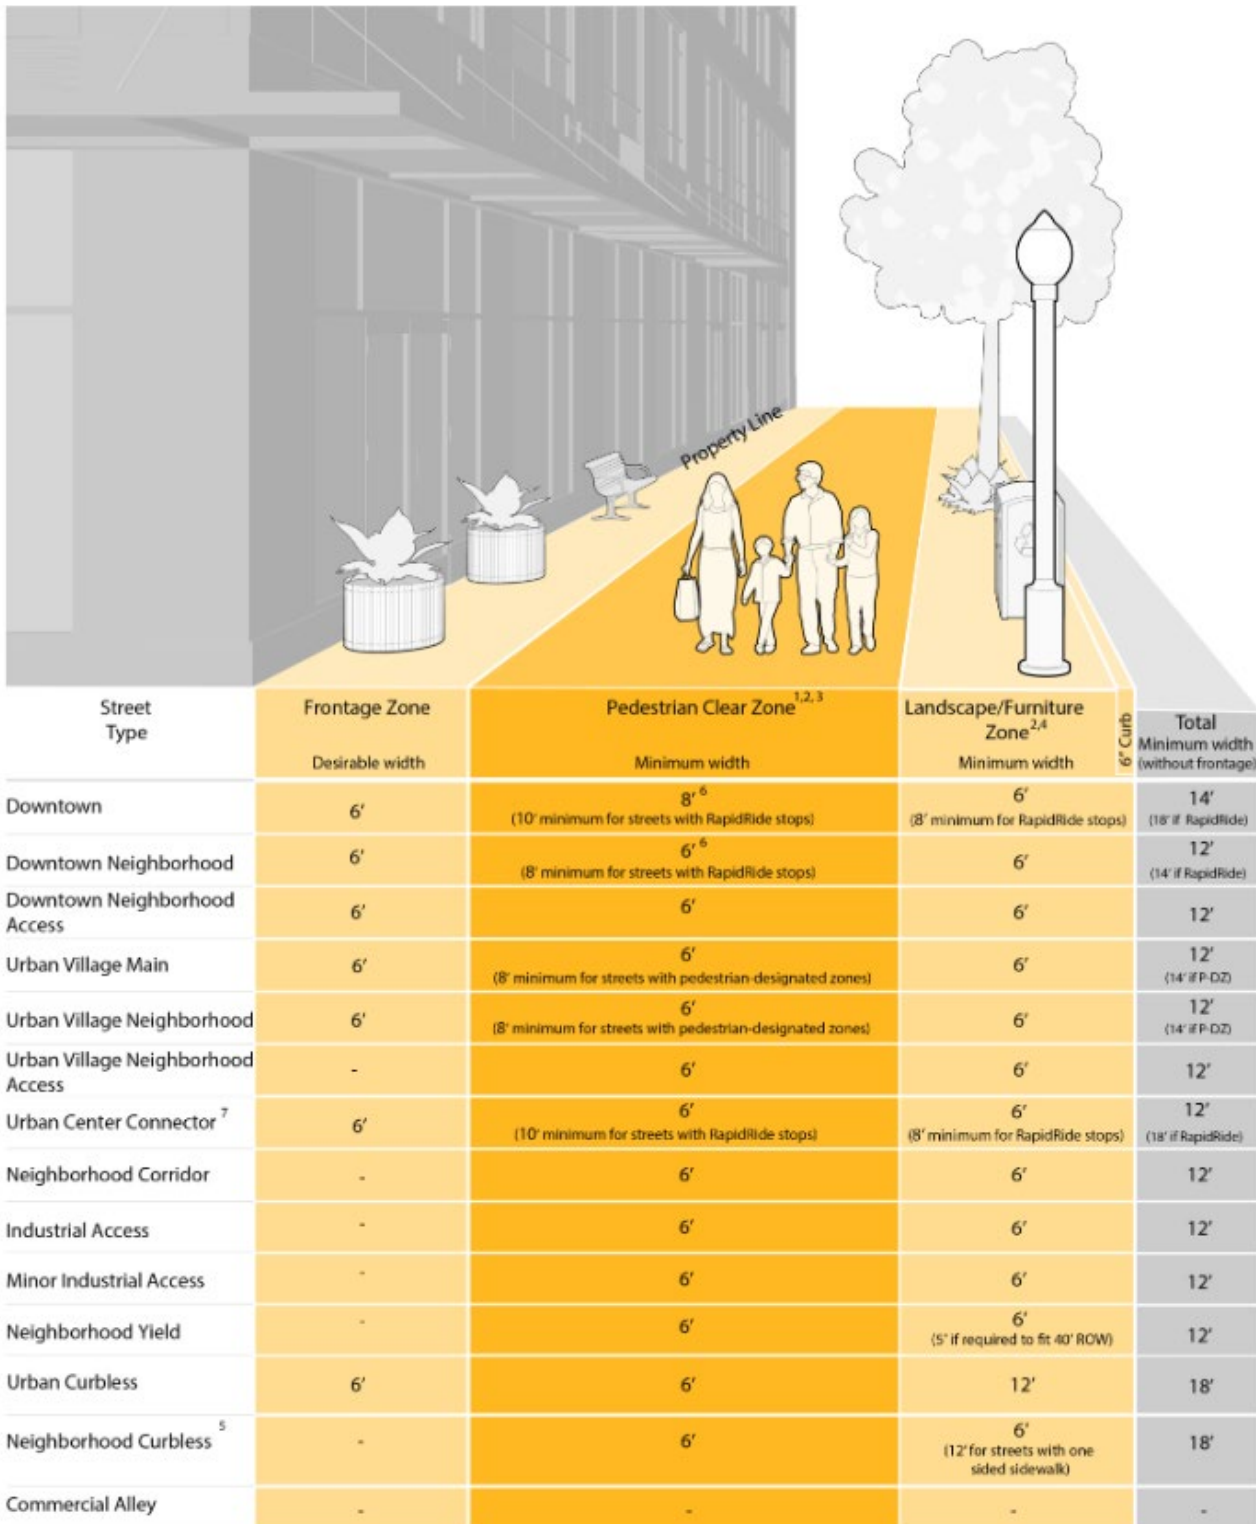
Sidewalk dimensions (Source: Streets Illustrated, 2017. <https://streetsillustrated.seattle.gov/design-standards/sidewalks/>)
